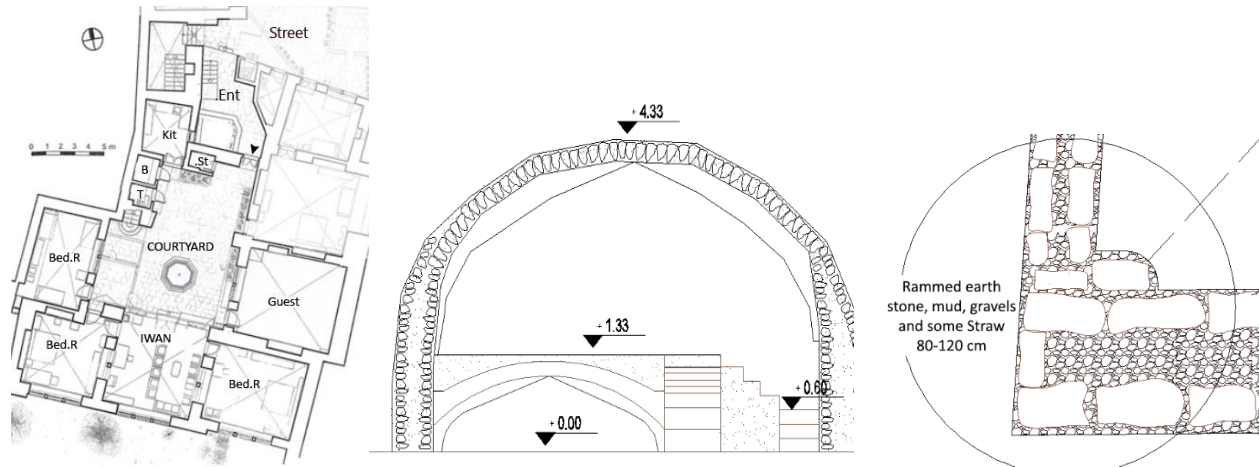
Construction strategies depending on load-bearing walls and ceilings
